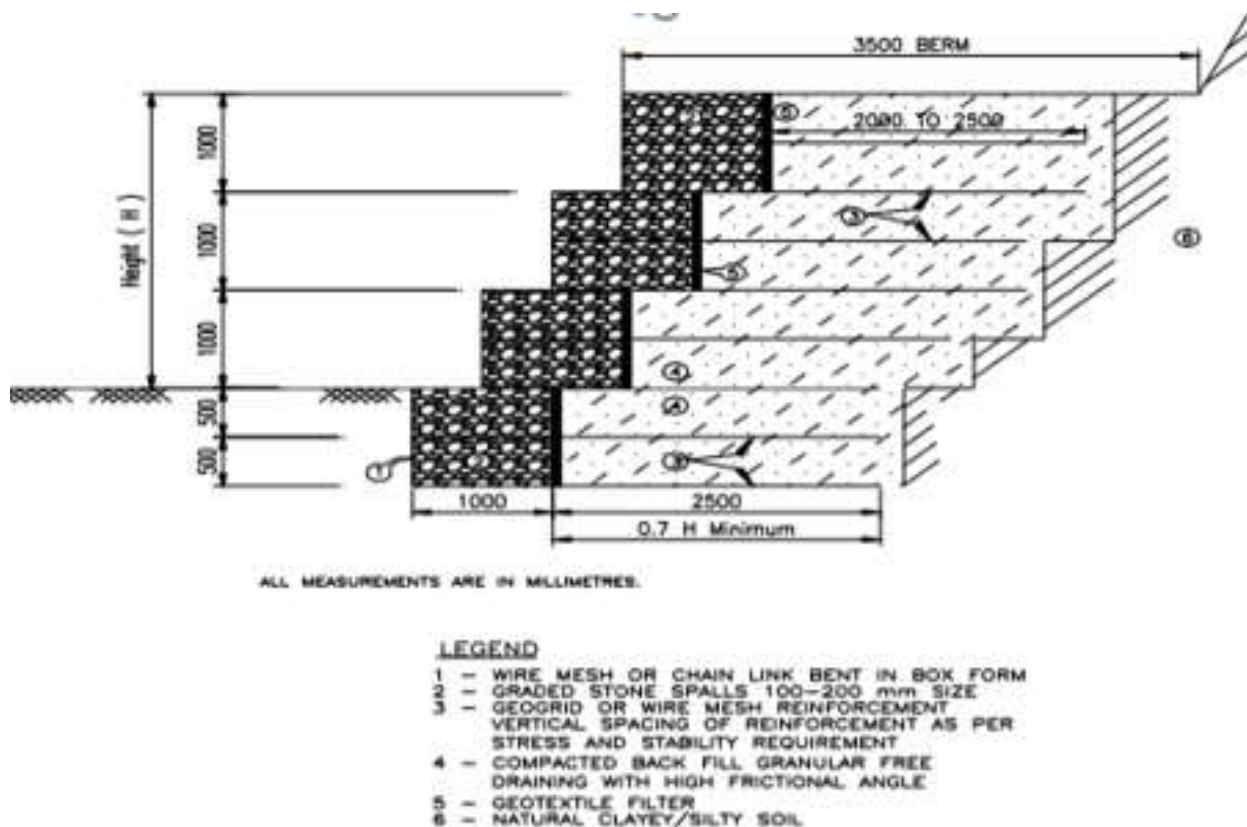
Gabion Wall with Geo grid Reinforcement
